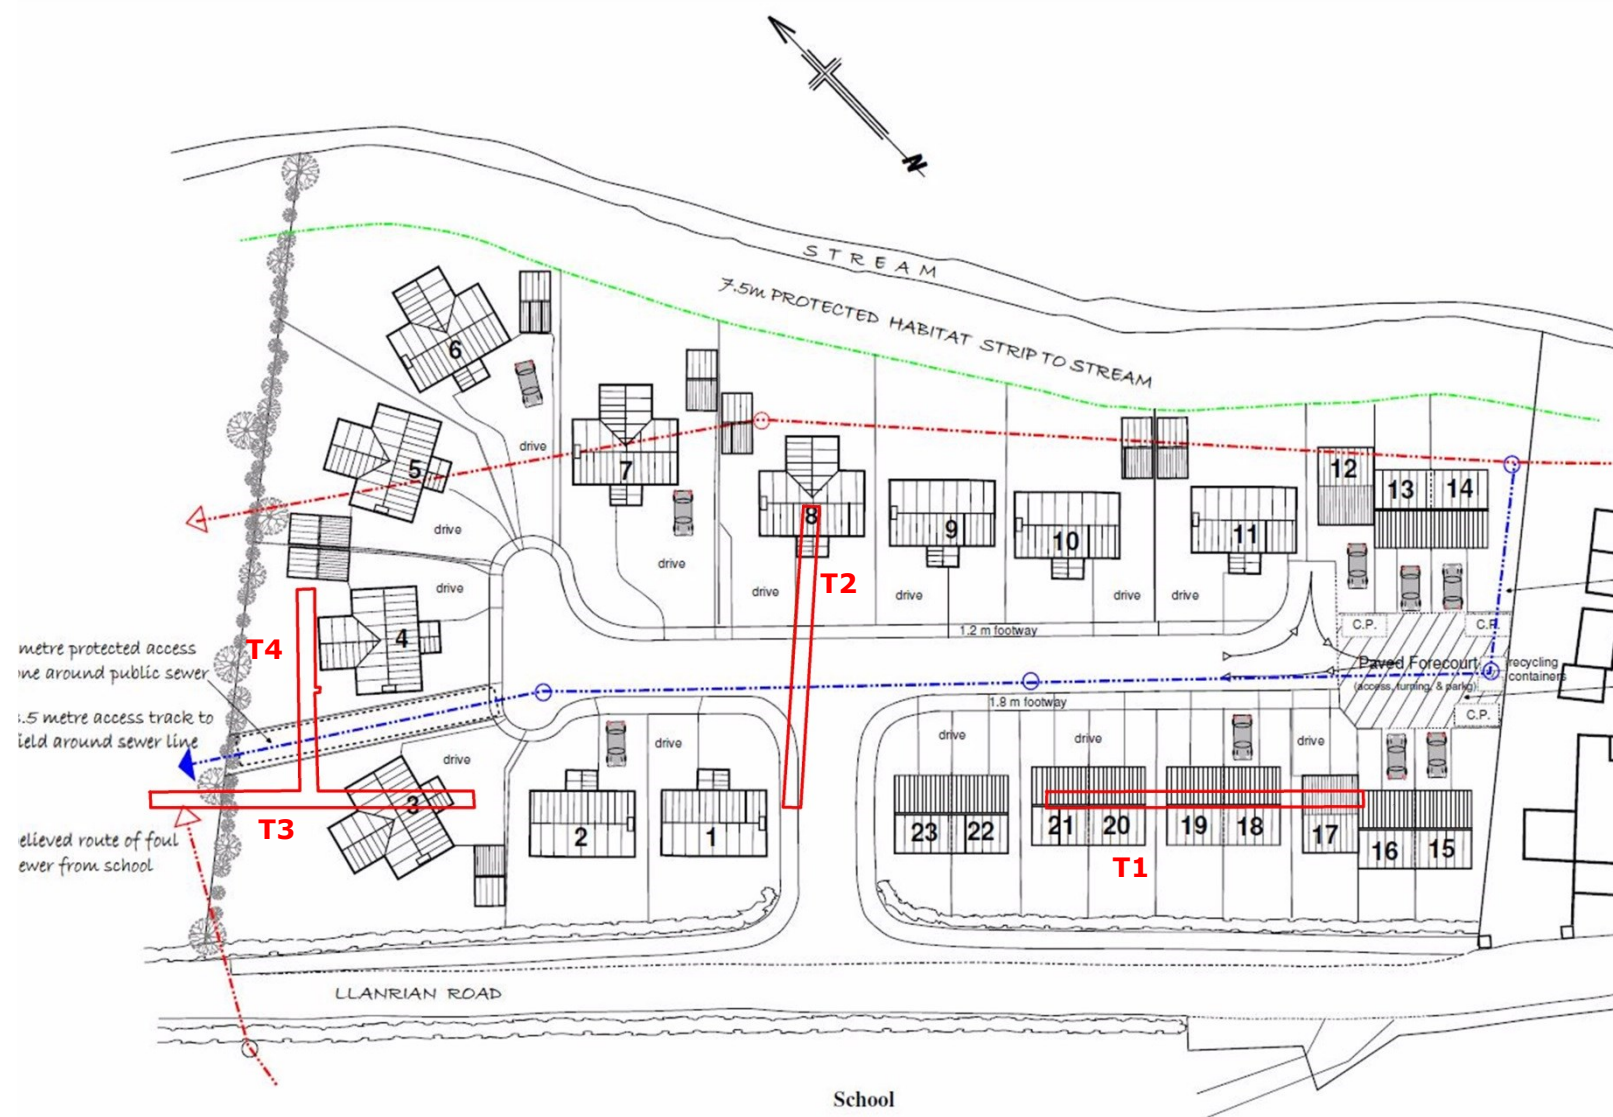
Proposed development layout (plan taken from Pembrokeshire County Council planning website) showing the position of the evaluation trenches excavated in 2016 (outlined in red).
